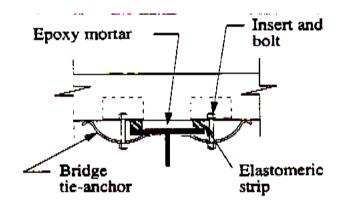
Grout dam built using elastomeric strips (Clark's Summit Bridge, Pennsylvania Turnpike)
